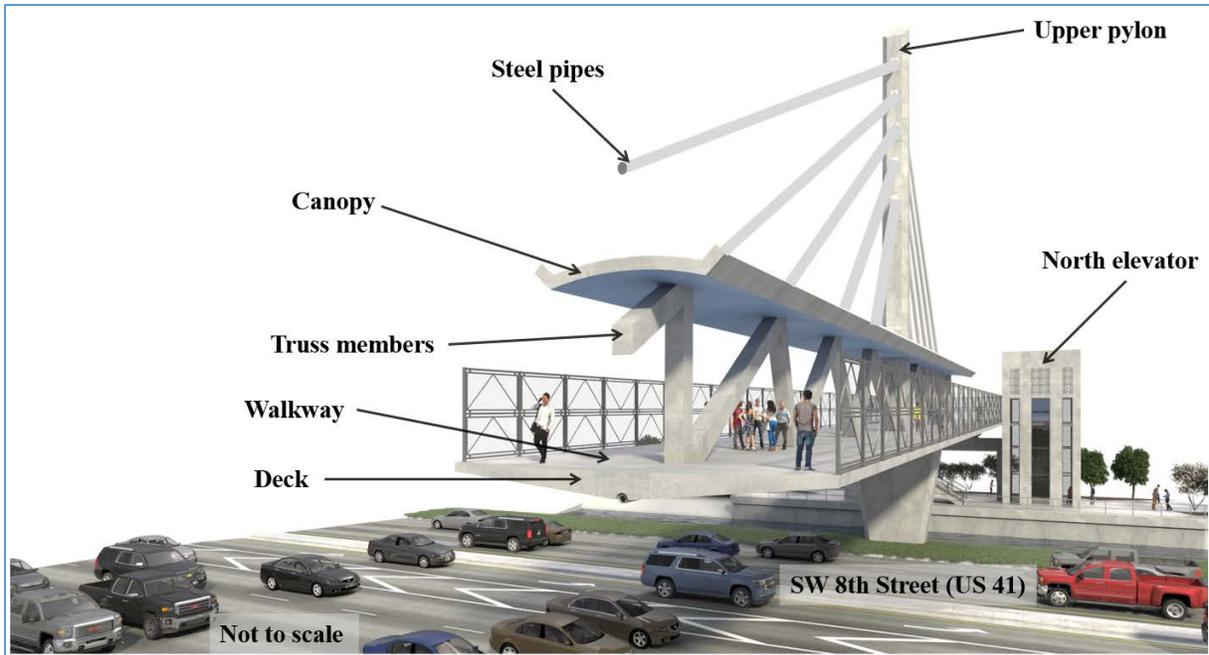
Cross-section rendering of pedestrian bridge, north view. (Source: FIU, modified by NTSB)
